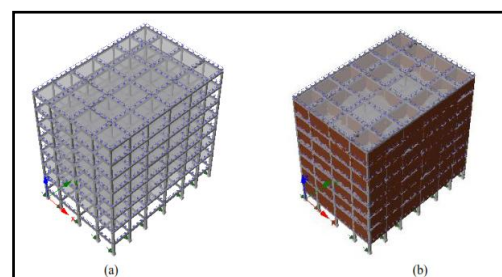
(a) 3D simulated G+6 bare frame building model, (b) 3D simulated G+6 infilled frame building model
